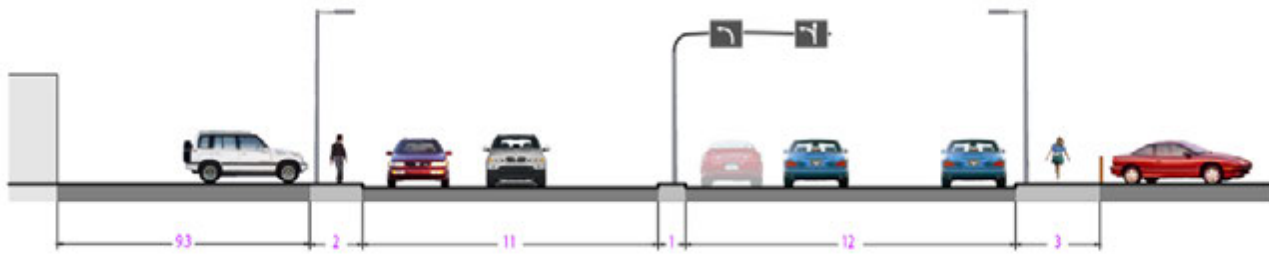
Figure 6.7: 22nd Street to 23rd Street Section
